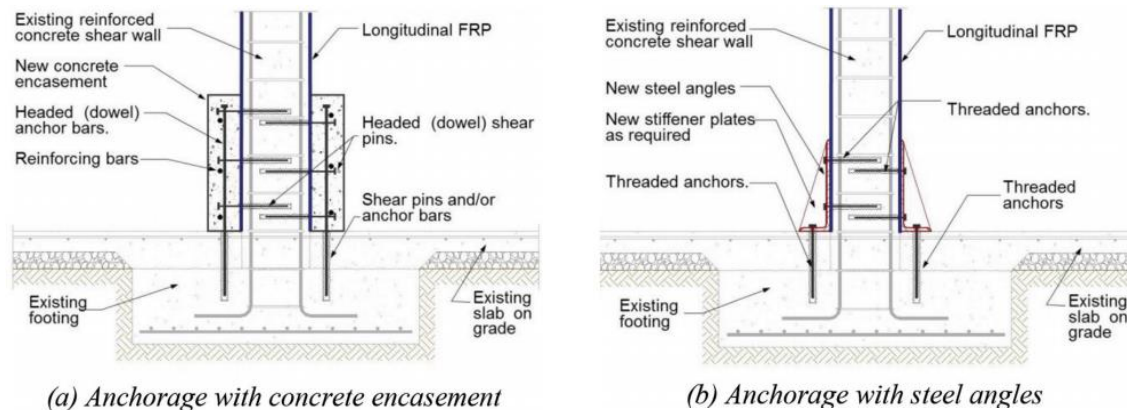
Conceptual anchorage methods for strengthened shear wall.
